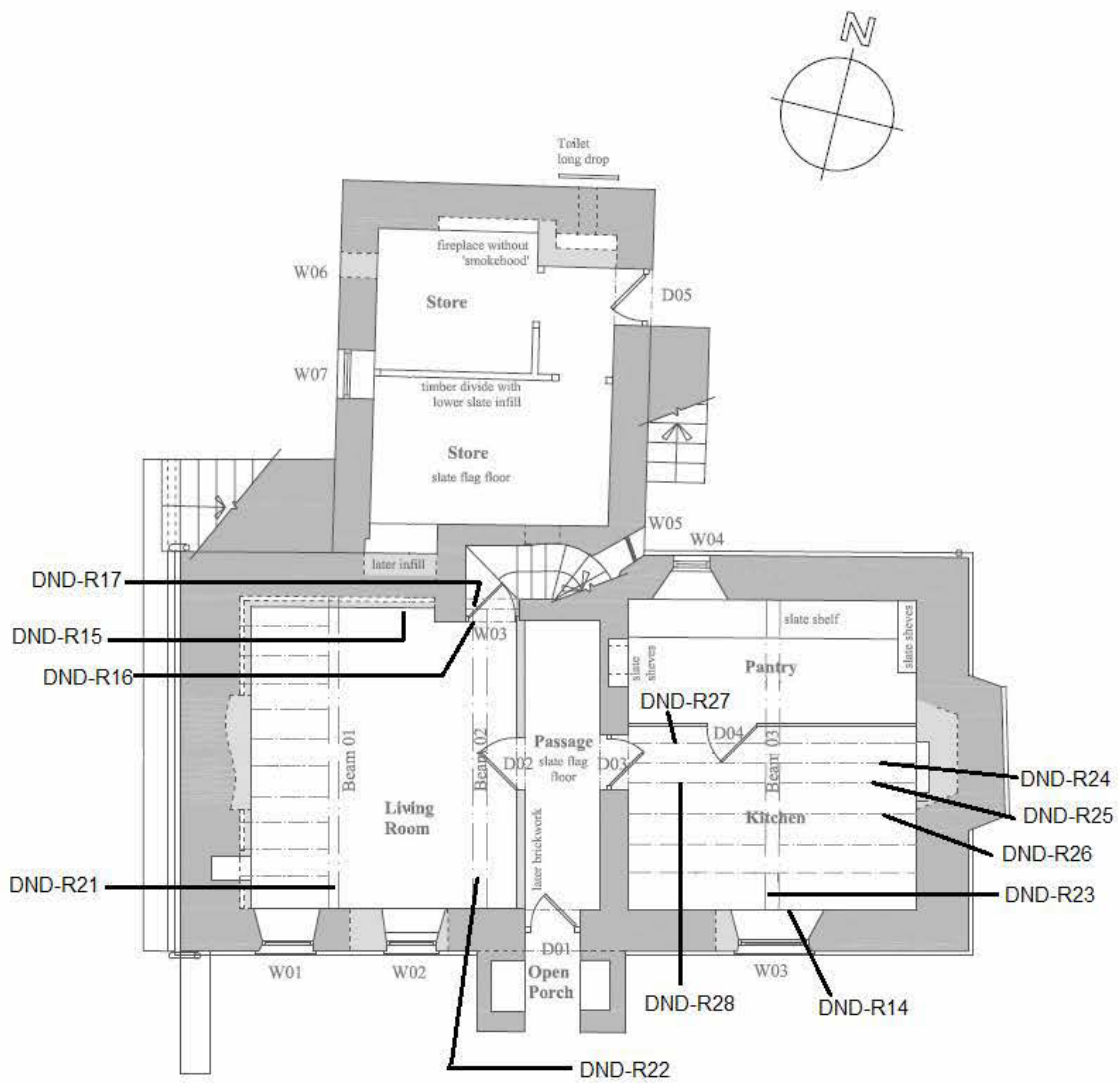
Ground-floor plan, showing the location of samples DND-R14–17 and DND-R21–8 (Paul Crosby Architect, annotated PFR)
